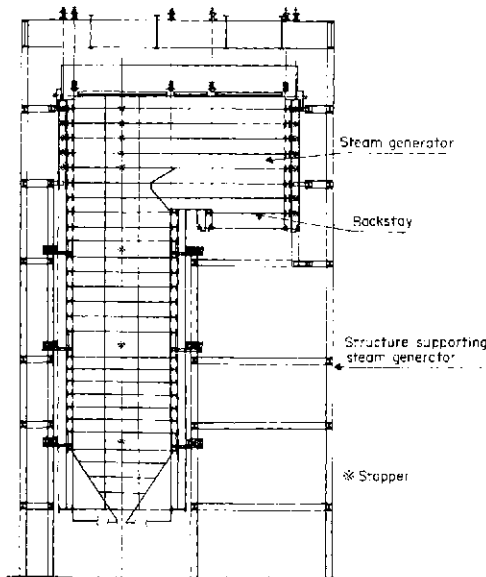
Elevation view of steam generator and supporting structure and location of stoppers.
